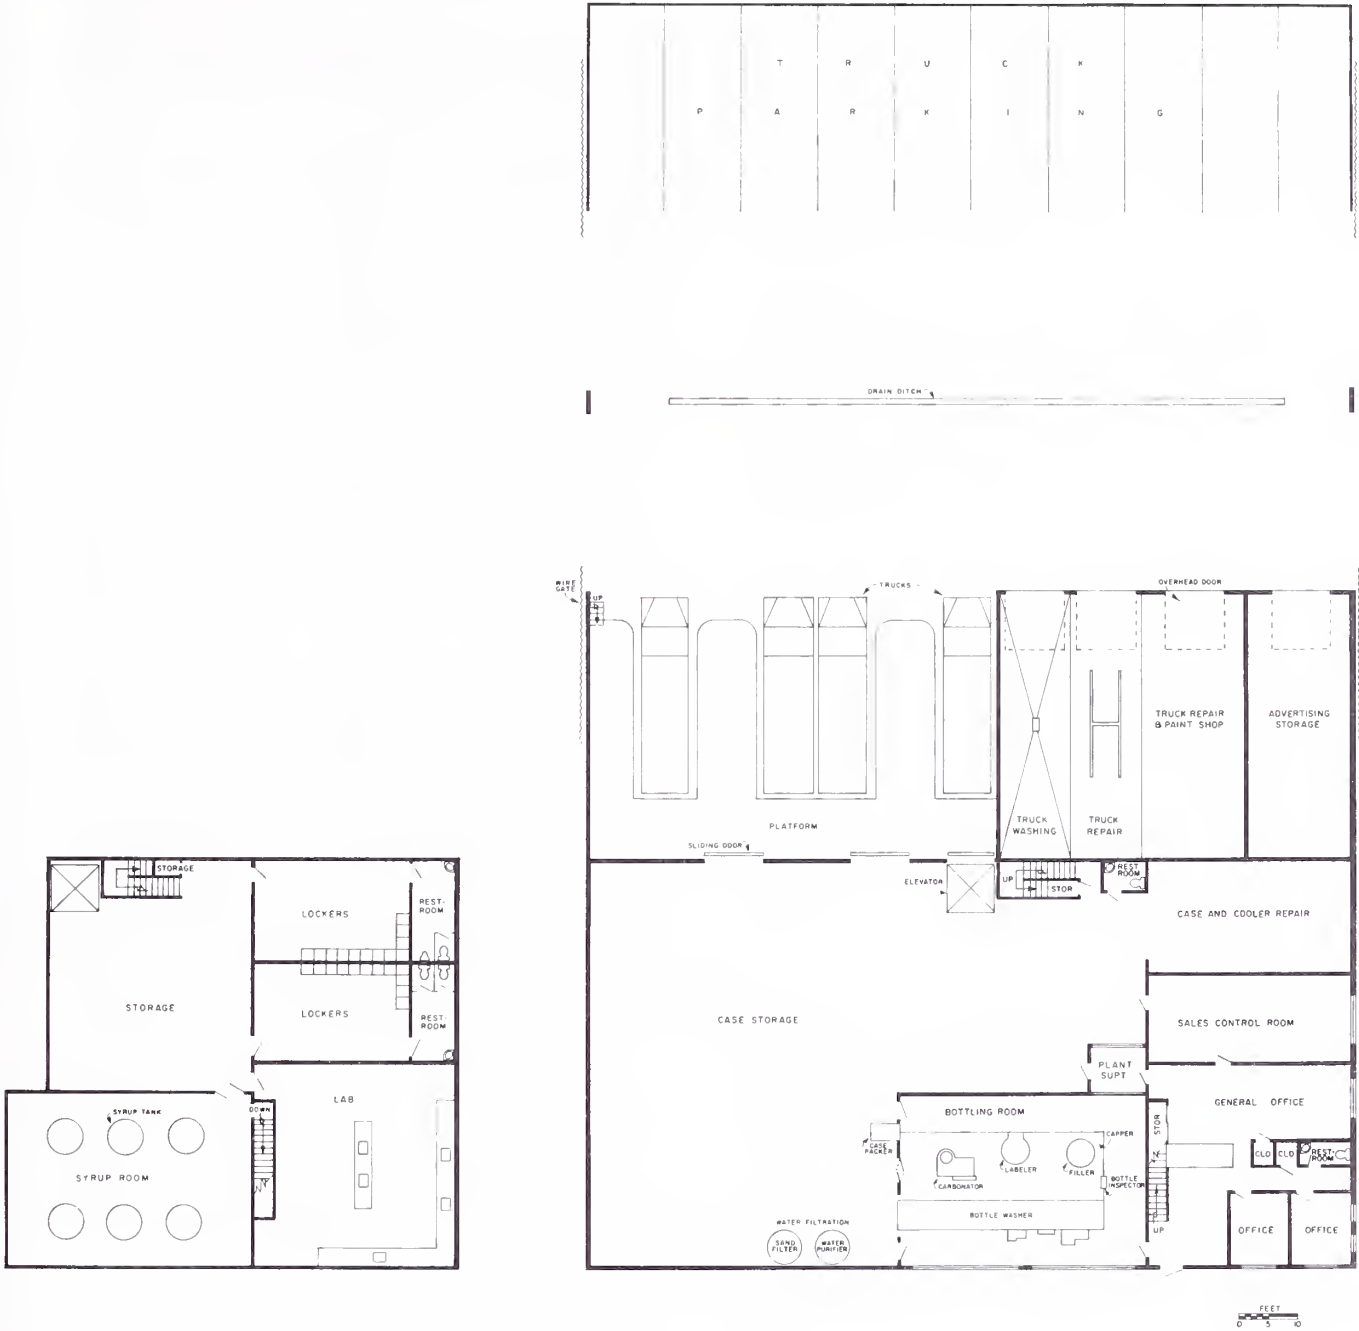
Layout of a bottling plant in a single-occupancy building.
